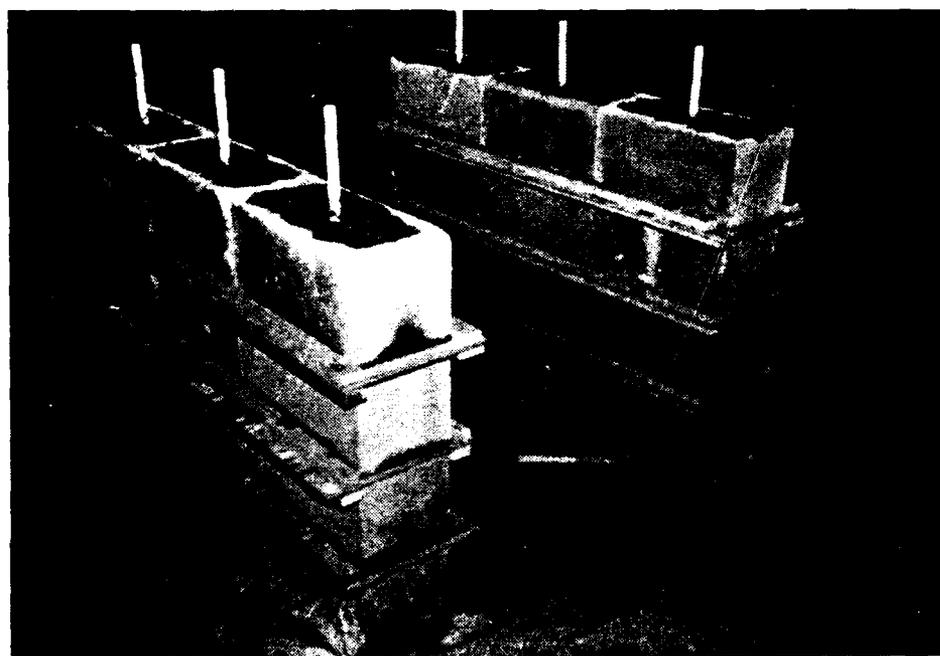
Stack-casting of Bottom and Top Concrete Masonry Units.
